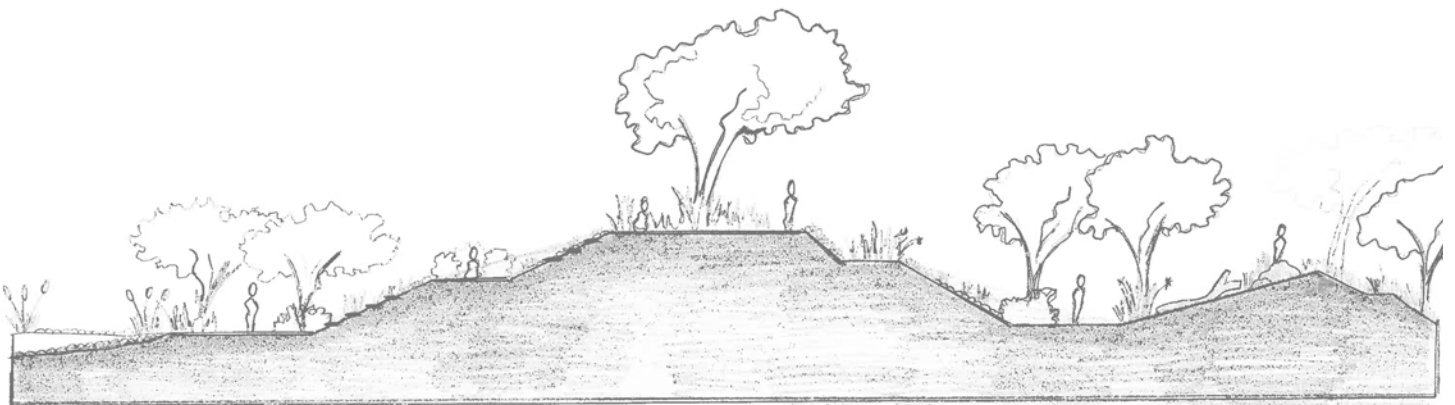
Development of sketch plan through exploring in section (Author, 2017)
